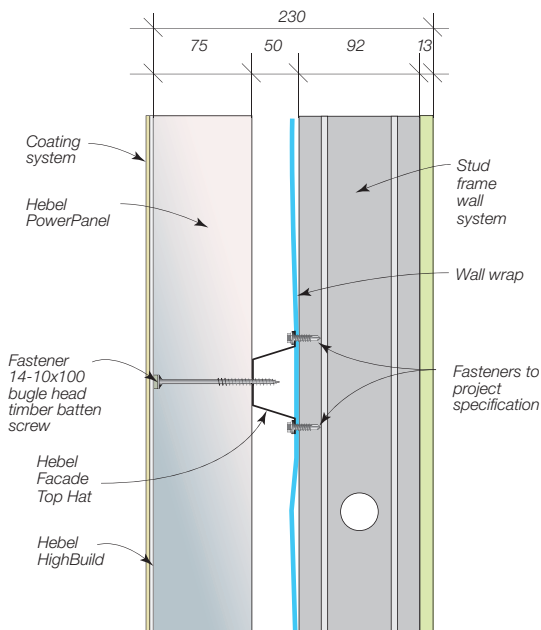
Hebel PowerPanel Fixing Detail (Visible Edge Beam shown)
